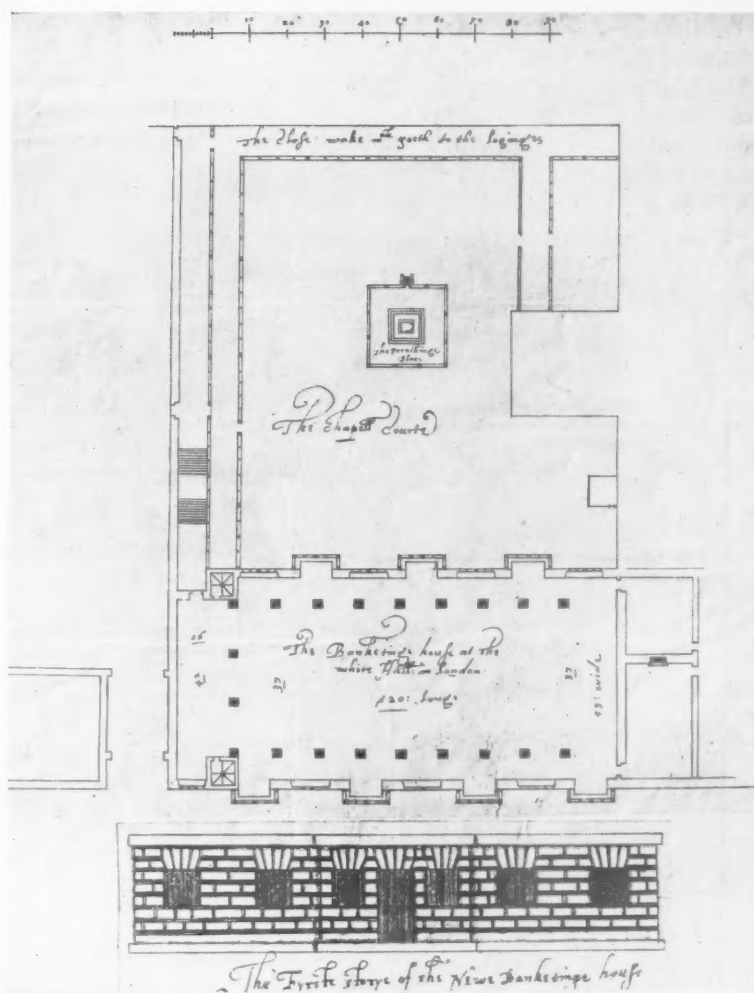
SMITHSON'S PLAN OF THE BANQUETING HOUSE OF 1607 (BURNT DOWN IN 1619) WHICH PRECEDED INIGO JONES'S
